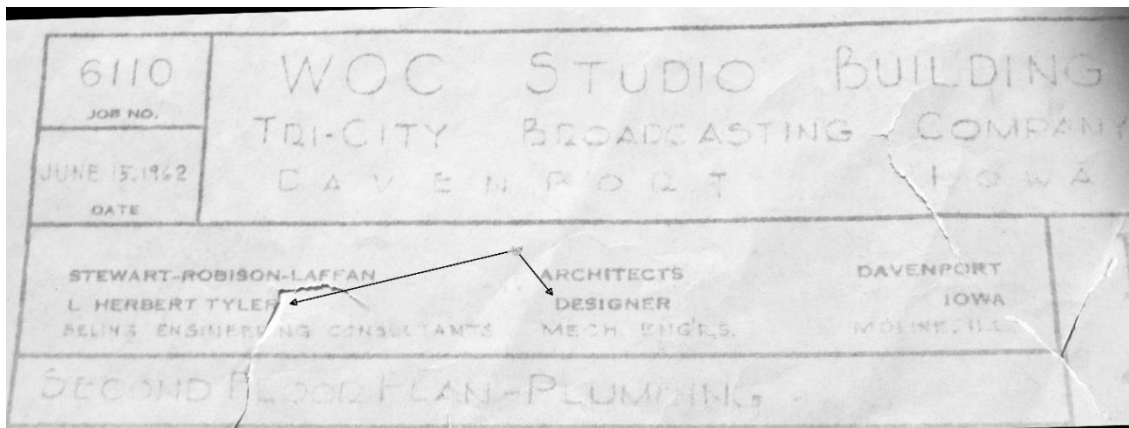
Detail, WOC Studio Building Plans (KWQC archives)
